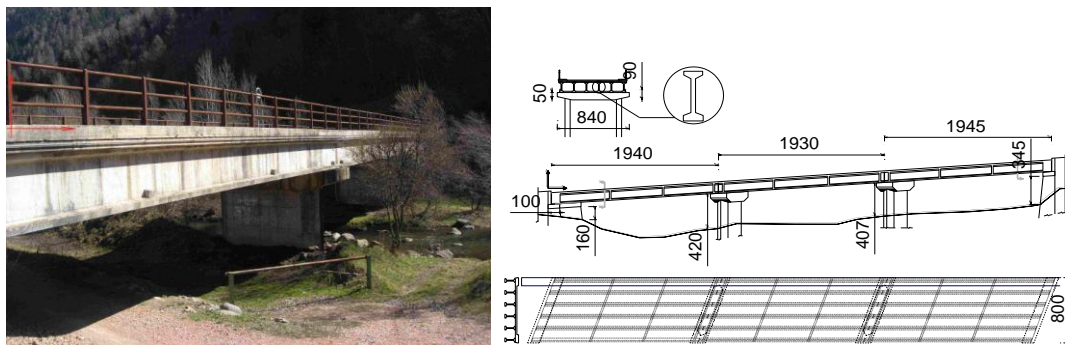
SP135 Bridge on River Fersina-Canezza (a) overview (b) Plan view, elevation and cross-section of the deck
